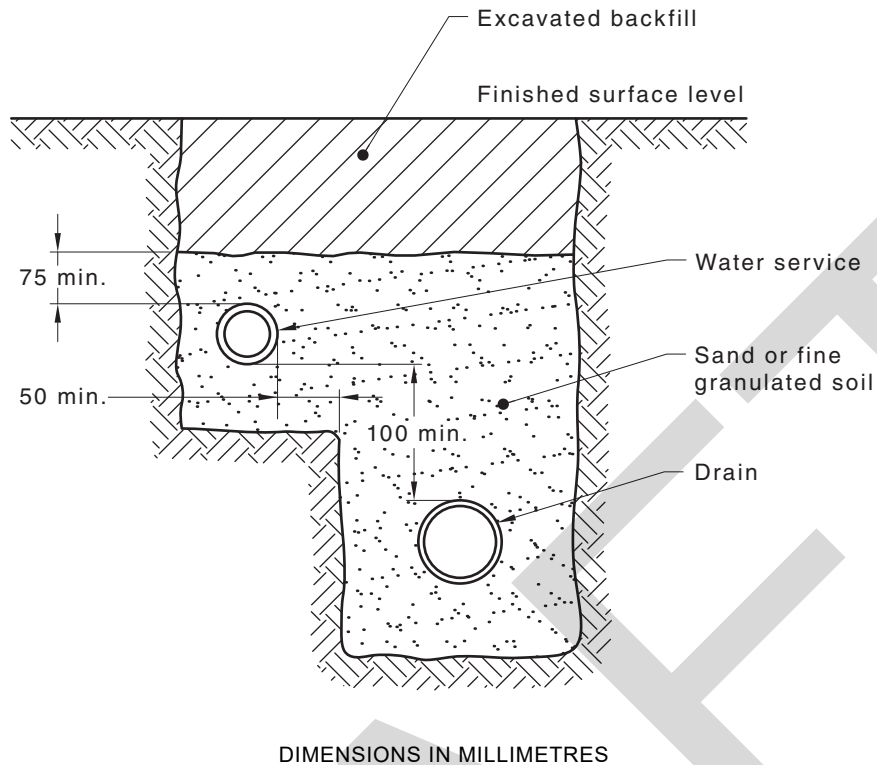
LAYING OF WATER SUPPLY PIPING IN SAME TRENCH AS A DRAIN
